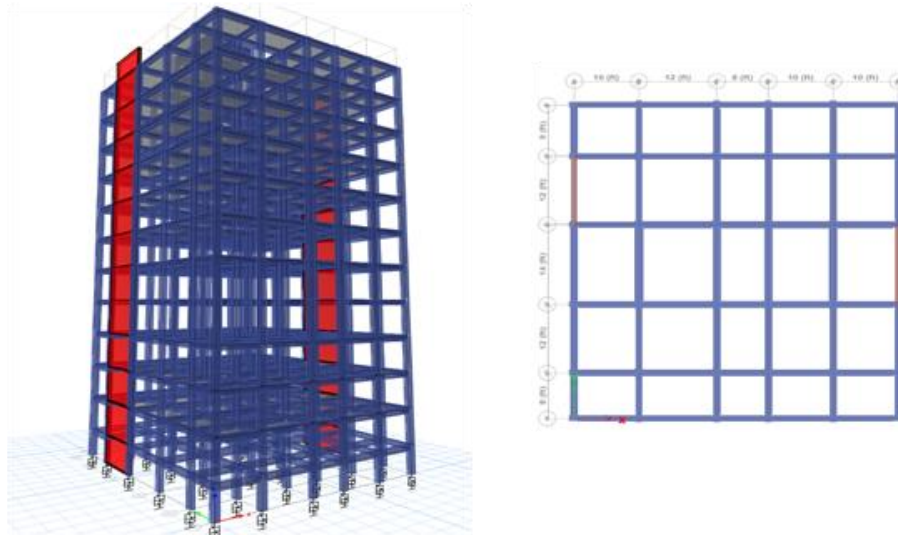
Lead Rubber Bearing Isolator installed in model (Plan, elevation view)
